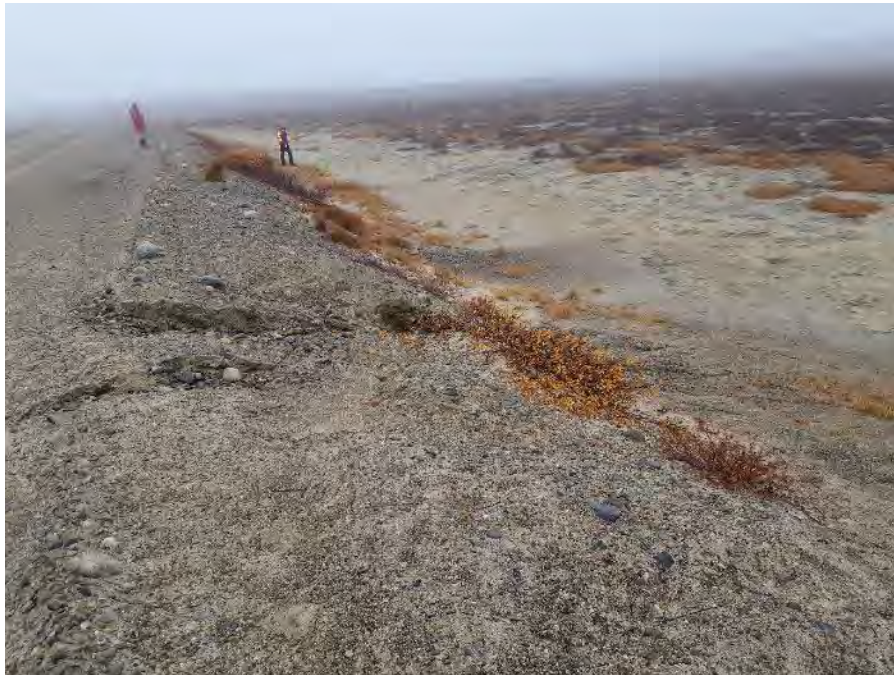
Dam 6 ponded water upstream of dam, edge of tailings cover, facing north (Fig. A1 ID#34)
